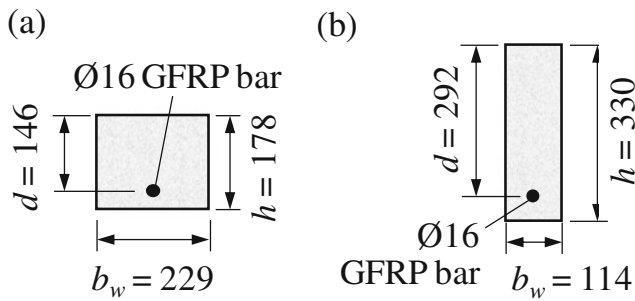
Cross section of GFRP RC beam specimens: (a) smaller scale, GS and (b) larger scale, GM (dimensions in mm)
